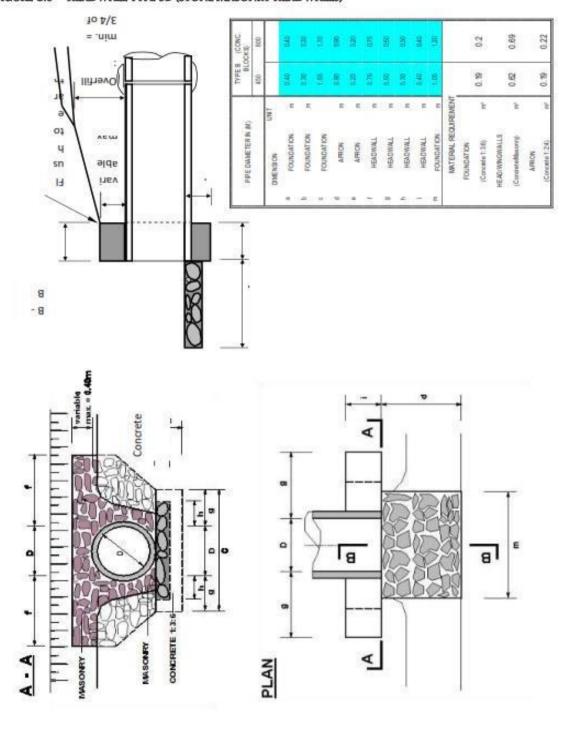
HEADWALL TYPE 4 (FOR ACCESS CULVERTS)
